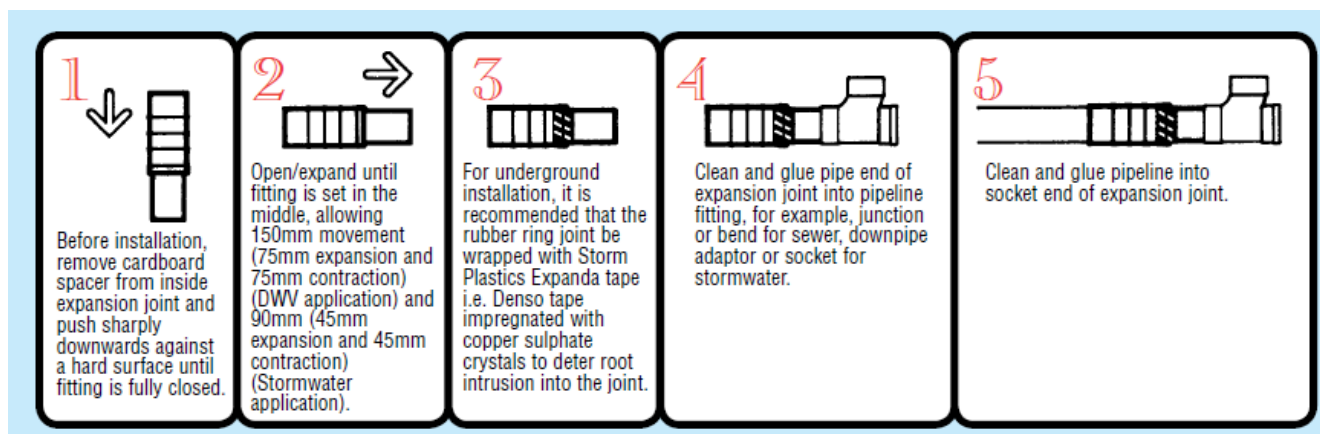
Guidelines for use of the Expanda Joint as a flexible coupling in drainage installations.
